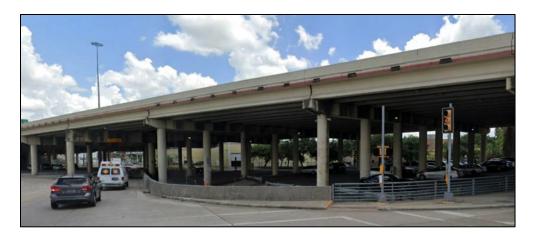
Horizontal openings on a bridge in Houston (Source: GoogleEarth, 2021)
